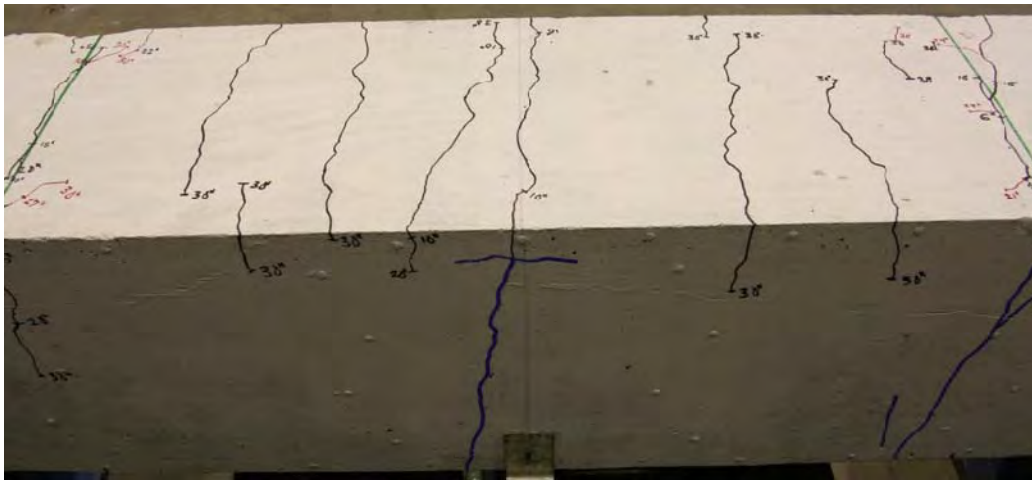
Photo. Side and top face of Beam A11-LN before failure.
